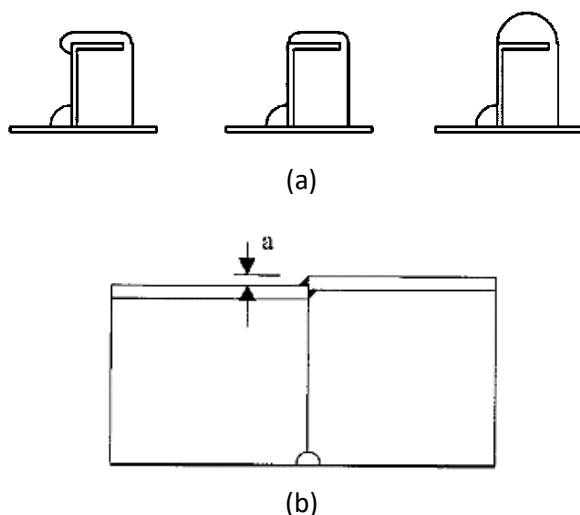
Structural Details: (a) Scallop Design; (b) Misalignment on Girder
